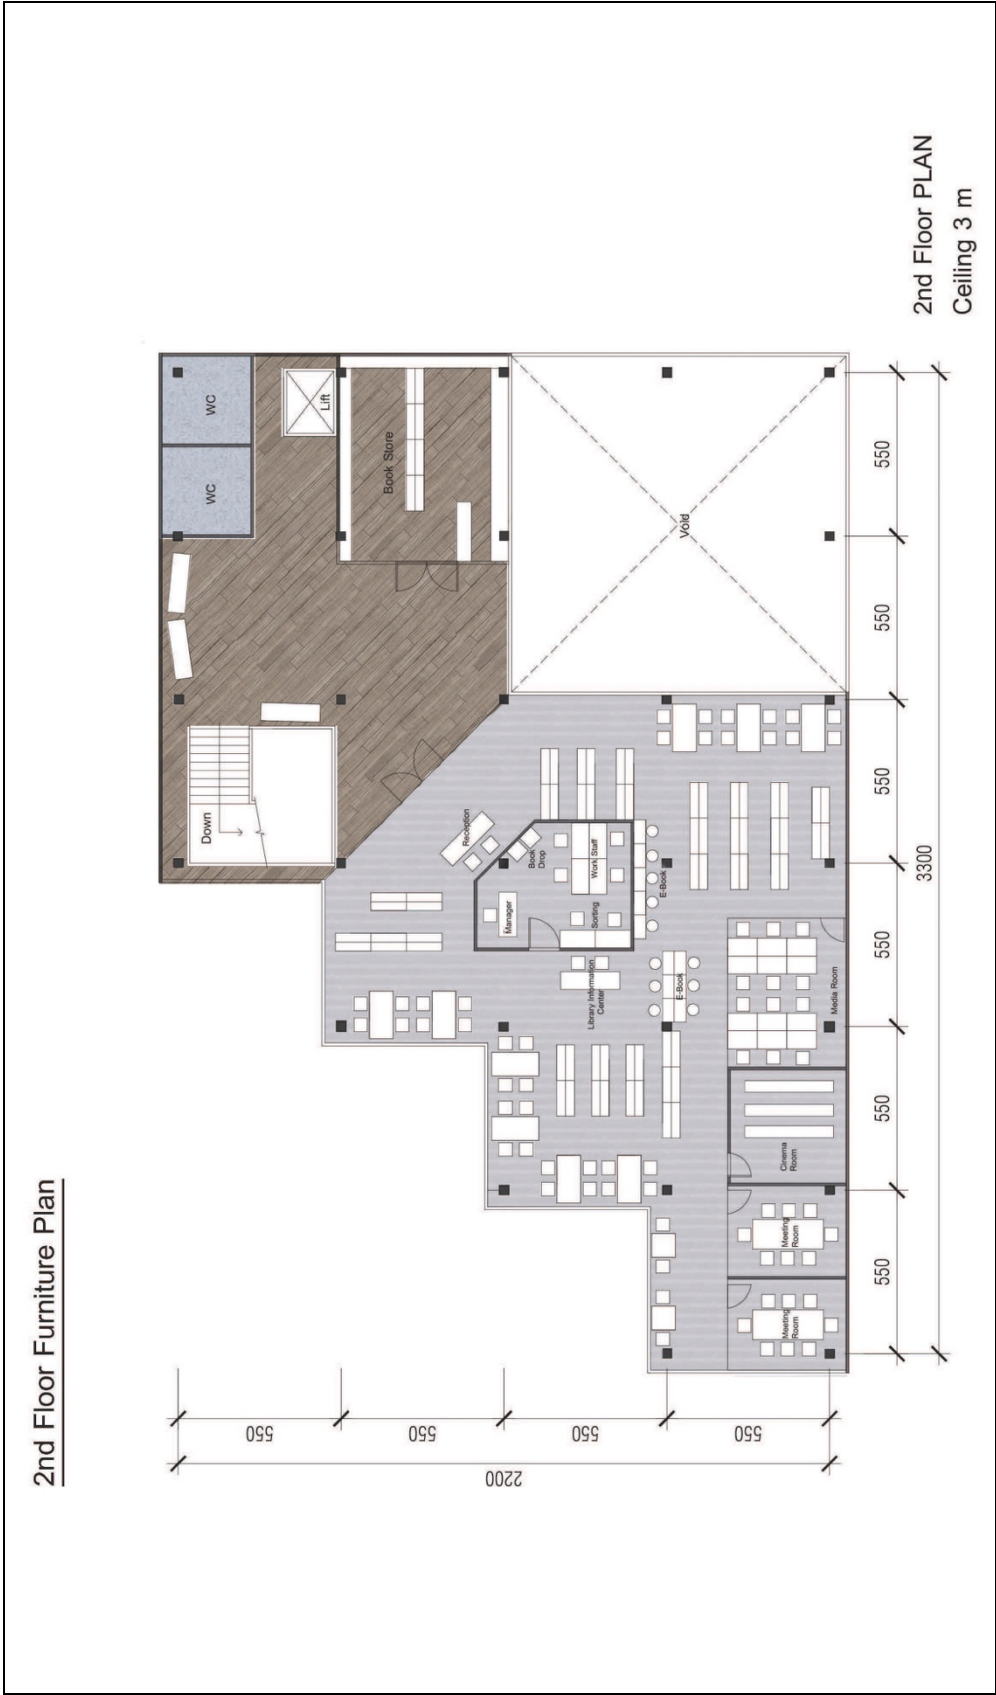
Storytelling to Reflection : Sample of Floor plan and zoning
